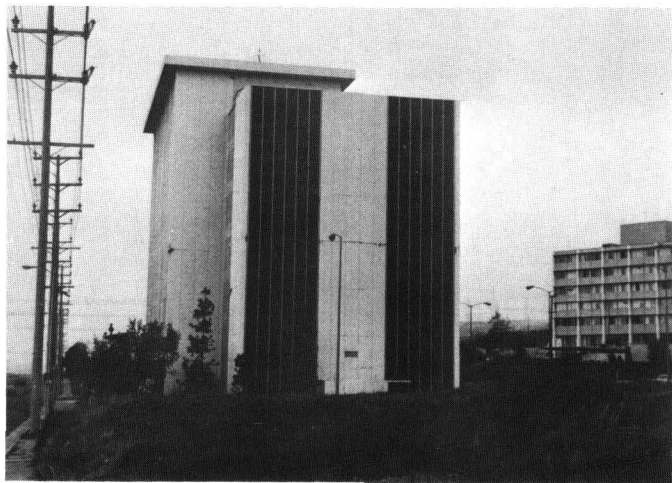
Indian Hills Medical Center. Note horizontal crack in center shear wall. J. F. Meehan, OAC Photograph.
